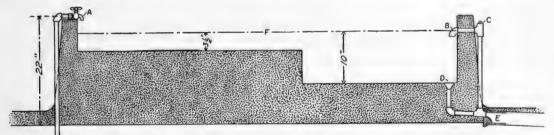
Sketch showing method of constructing a concrete milk trough. A, Faucet for admitting water; B, overflow pipe; C, cleaning plug; D, outlet plug for cleaning trough; E, tile drain; F, level of water in trough.
